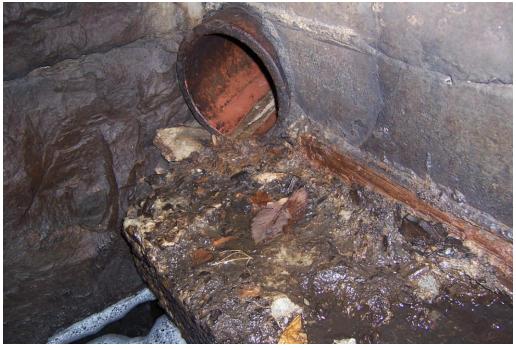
Facing East. 106' north of the cemetery entry manhole. 12" diameter inlet pipe in the southeast corner of the stone arch culvert
